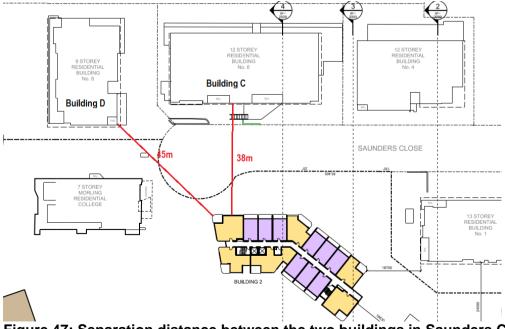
Separation distance between the two buildings in Saunders Close and the proposed development.
